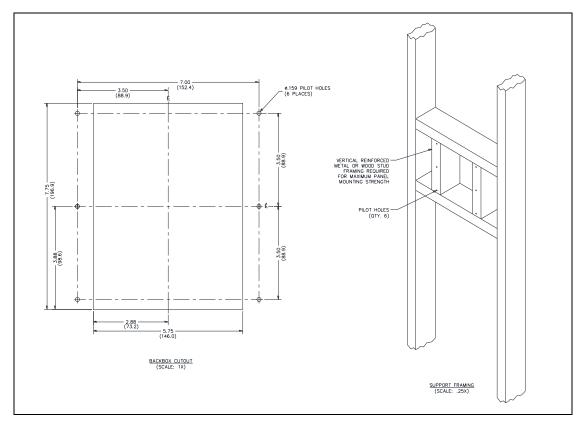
Models 277-712BH/-712BHAC Cutout and Support Framing Detail
